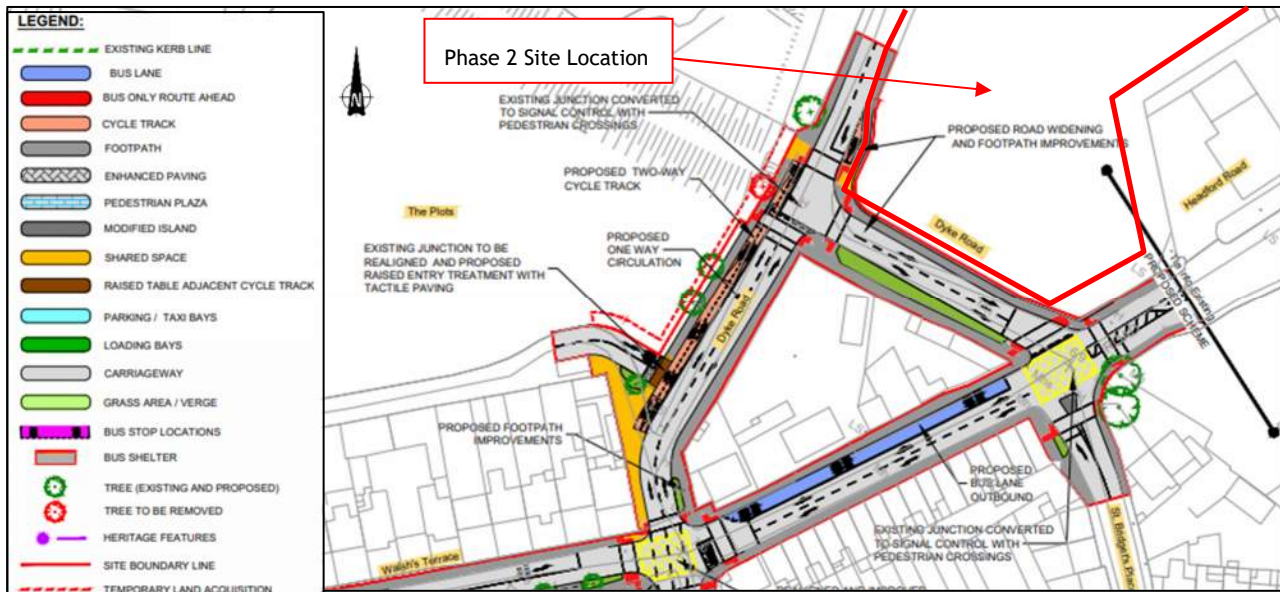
Extract from Bus Connects Route Beside Proposed Site (Ref: NTA Sheet 3)
